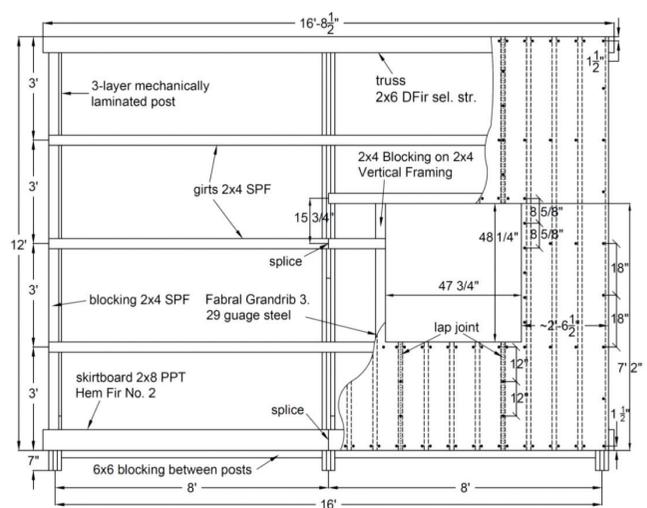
Case 2: 4' x 4' window opening with extra fasteners around the window
